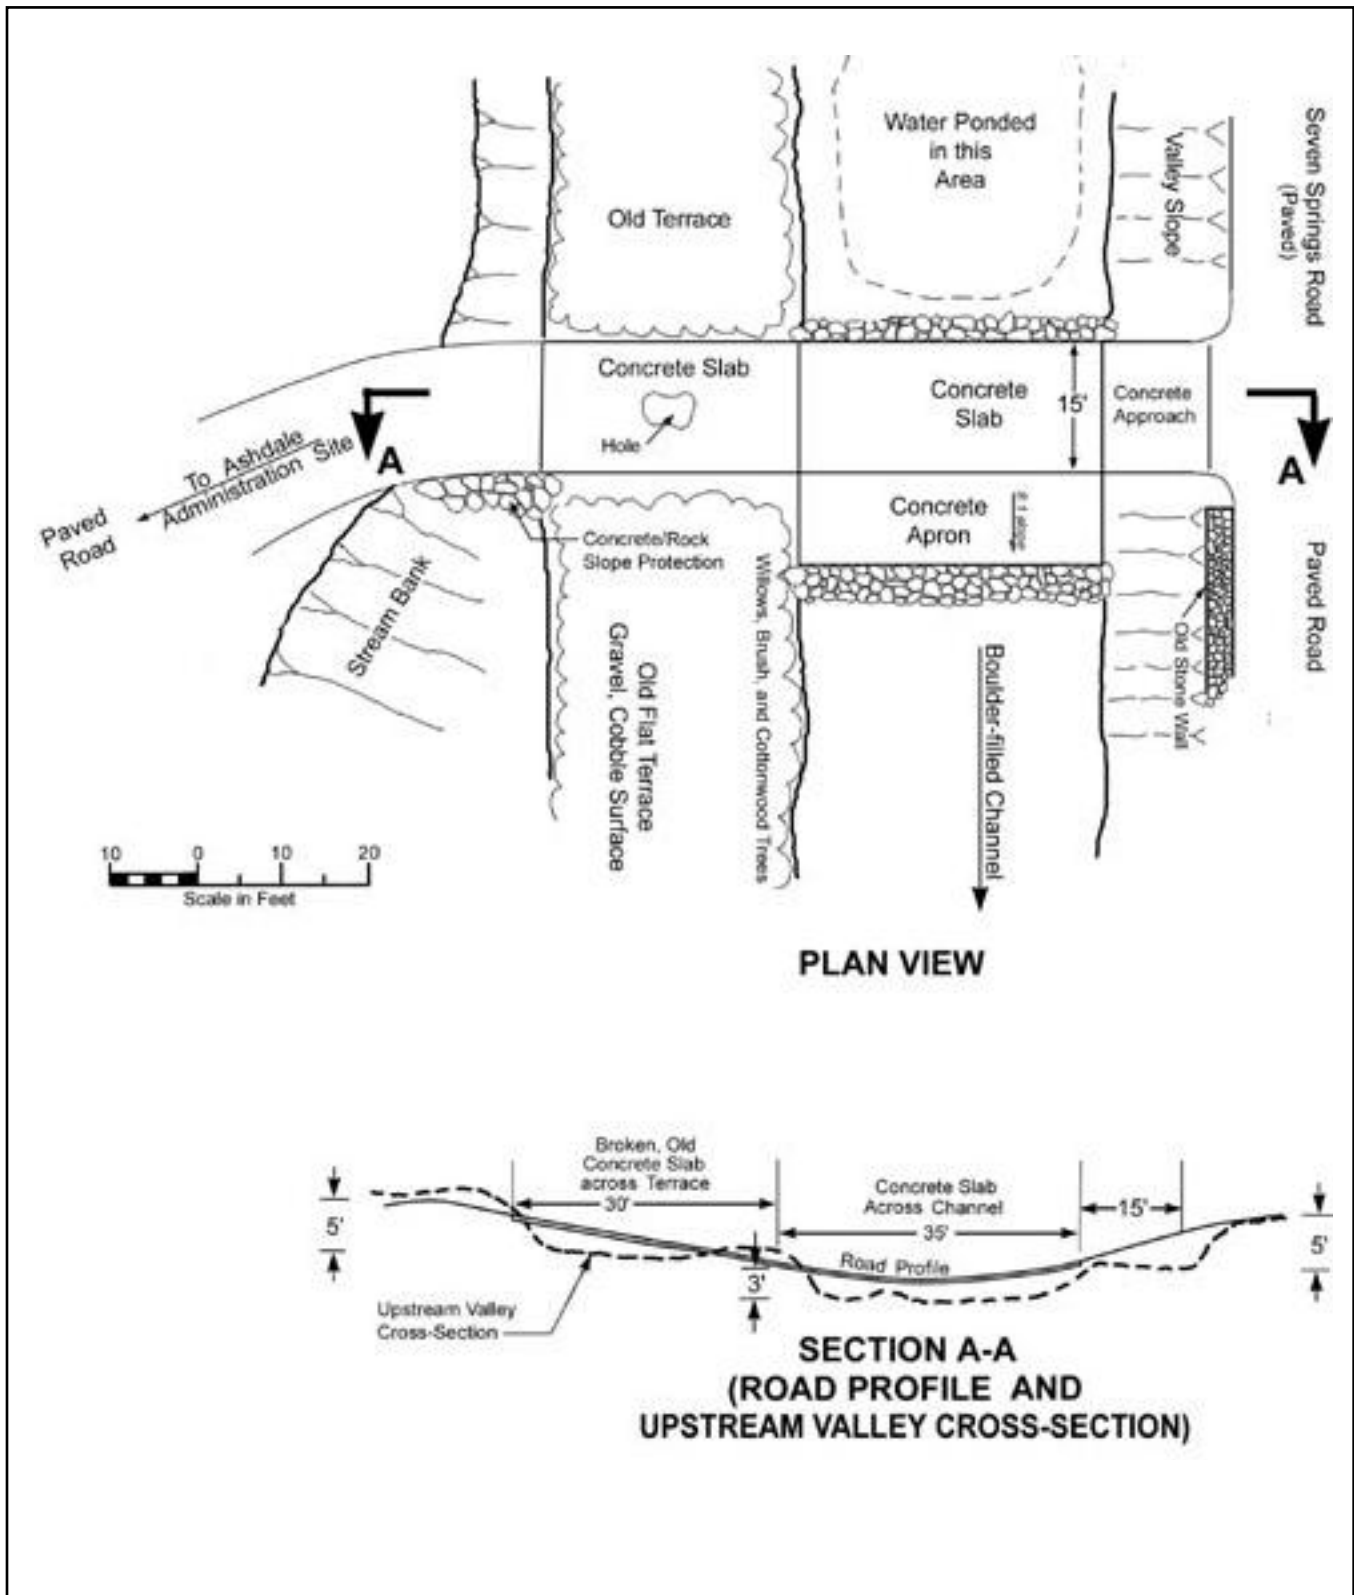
Ashdale ford plan view sketch and valley cross section with road profile.
